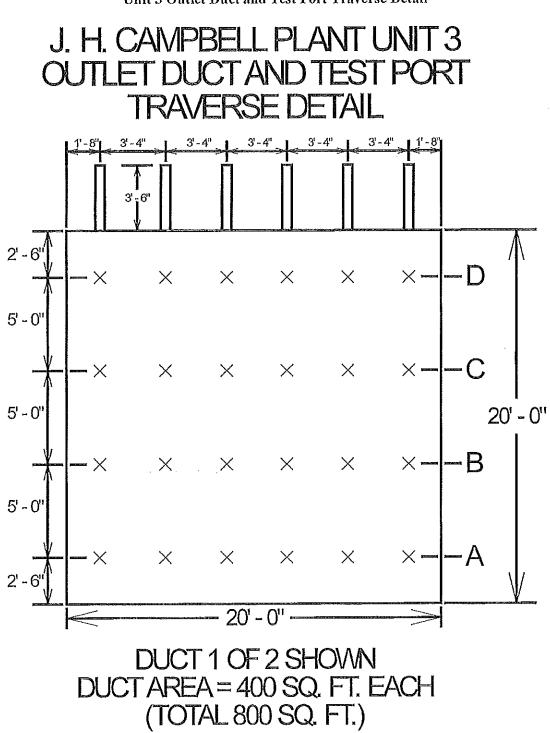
Unit 3 Outlet Duct and Test Port Traverse Detail
